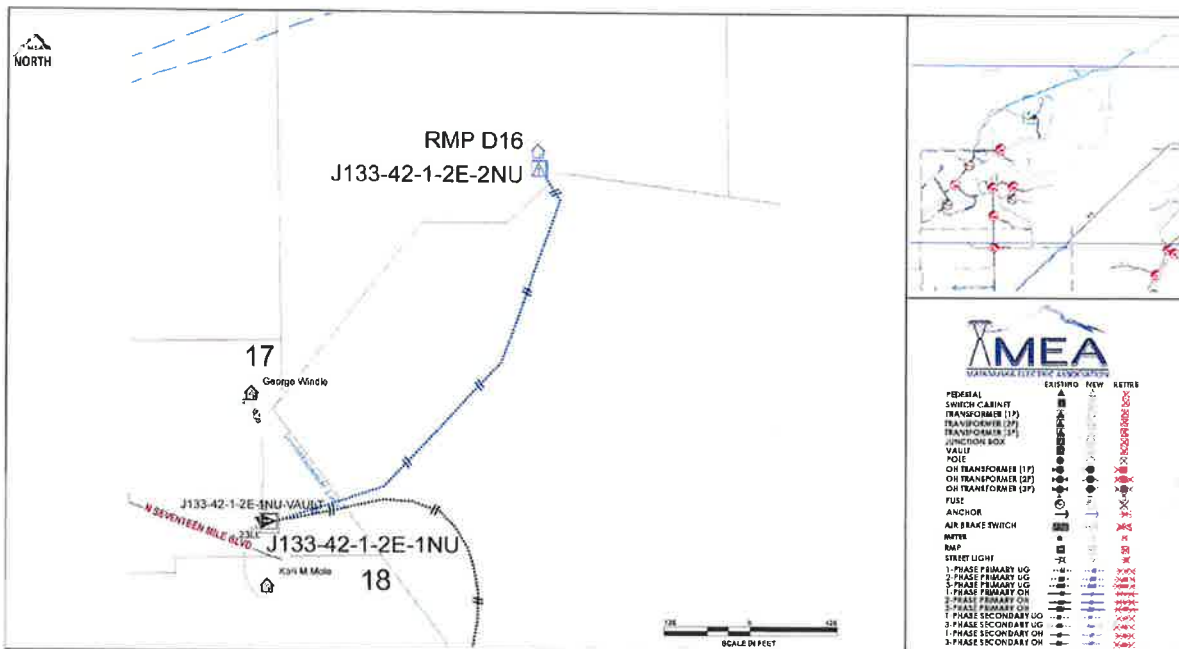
Close up of an applicant-provided depiction of the proposed electrical line easement.
